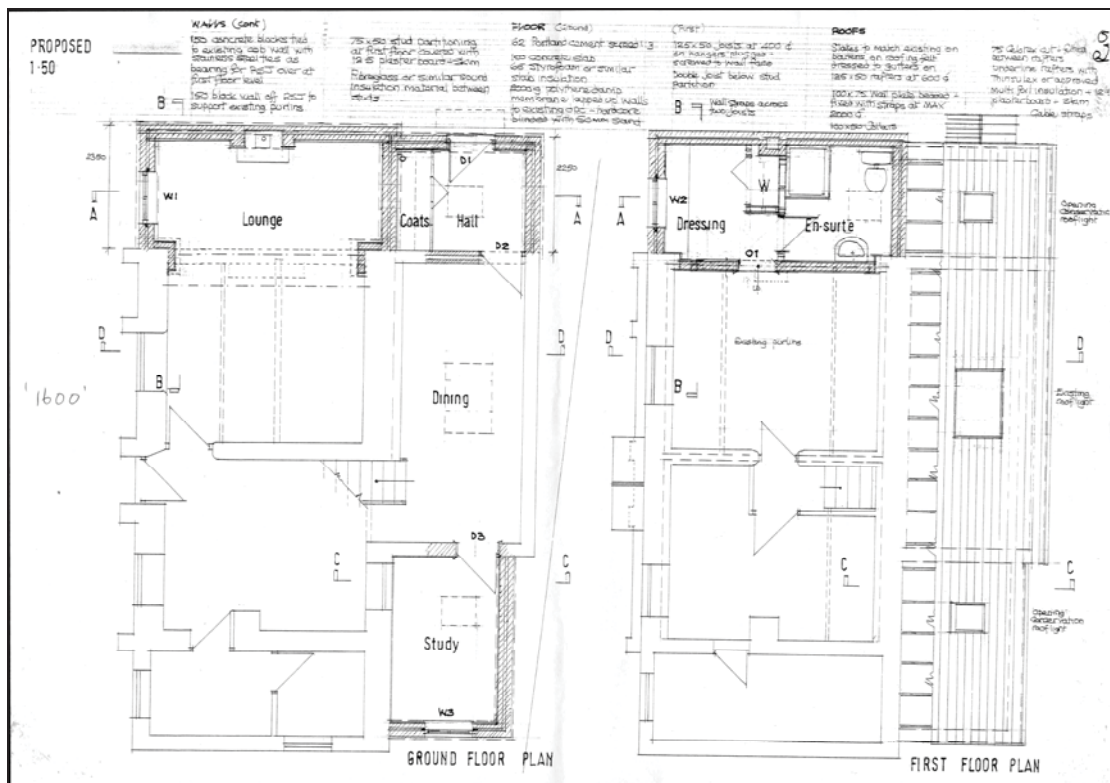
Scan of proposed floor plan of 8 Manor Road, Great Bowden (provided by the client).
